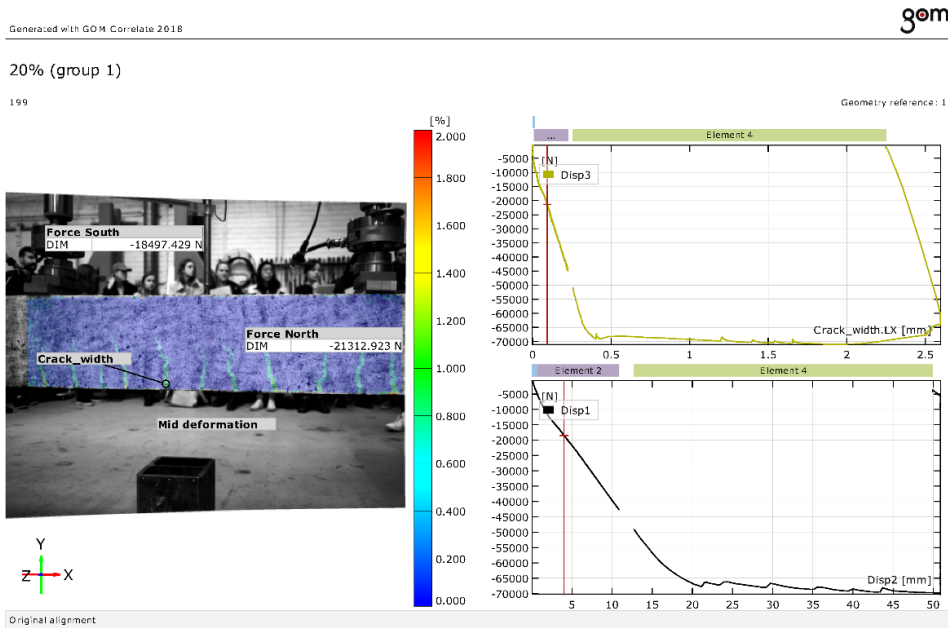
Result summary of two-point loading test of beam with 20% replacement.
